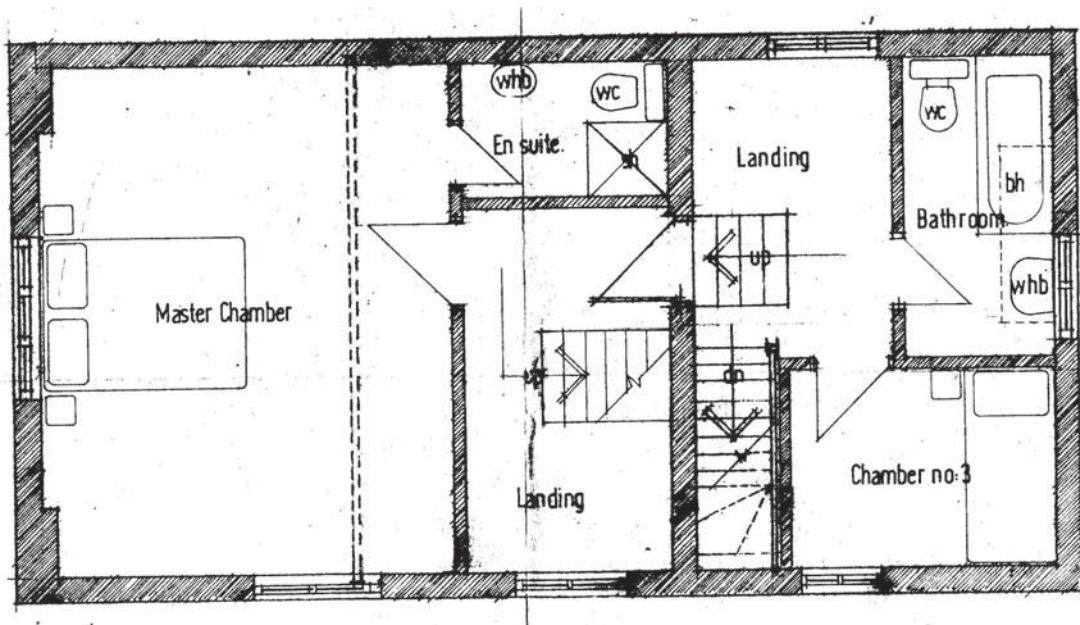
Proposed first floor plan (Haywood Exclusive Homes).
